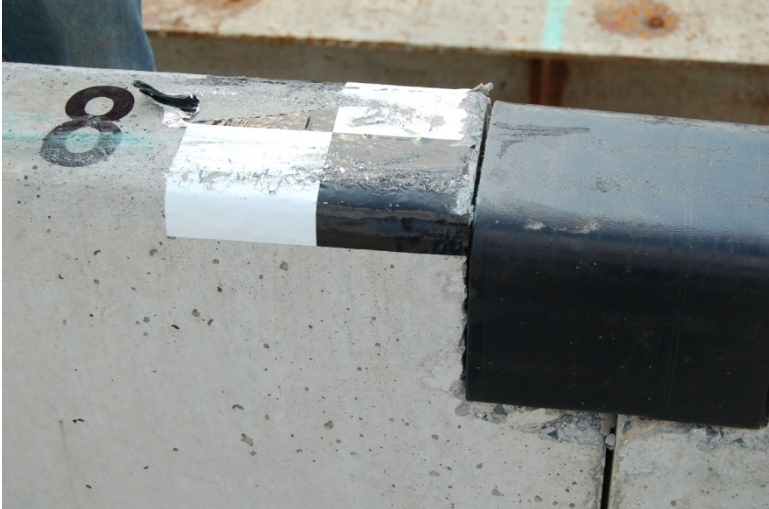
Barrier No. 8 Damage, Test No. NYTCB-5
